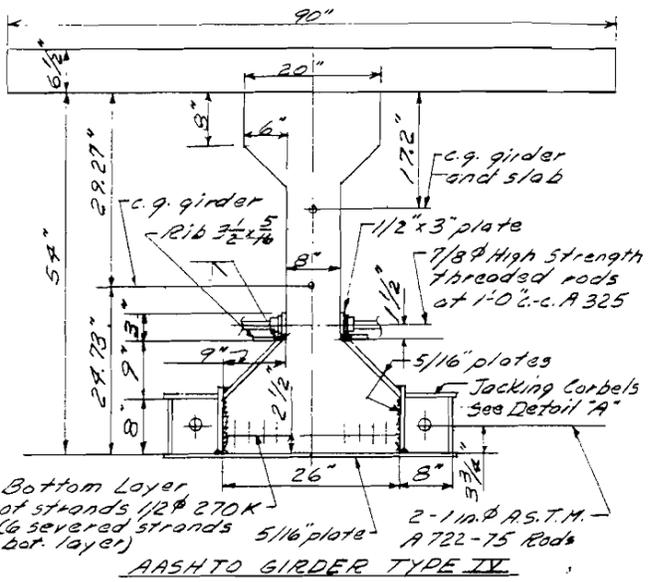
Splice 5: Combination of external PT and steel jacket. In this case steel jacket also anchors PT. (Shanafelt and Horn 1980)
